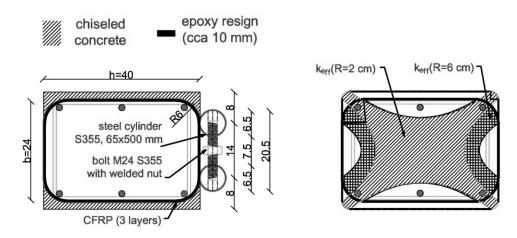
Plan view of the strengthened column with pretensioning system (left) and the comparison of effective confinement area contained by four parabolas in case of typical (R = 2 cm) and refined (R = 6 cm) level of corner radius with removed concrete cover (right)
